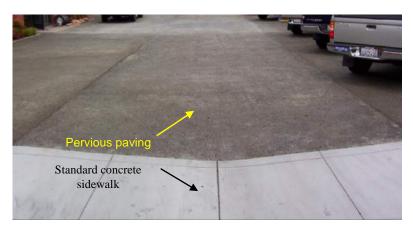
Parking Lot with Pervious Pavement, Emeryville
